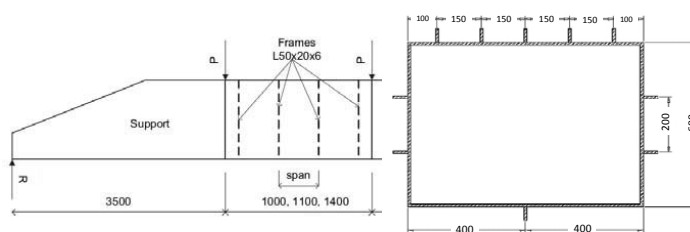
Schematic of the test rig used for the experimental tests of the three box girders (left) and cross section of box girders (right). All plate and stiffeners are 4mm thick. Stiffeners are 20mm height (Gordo and Guedes Soares, 2009).
